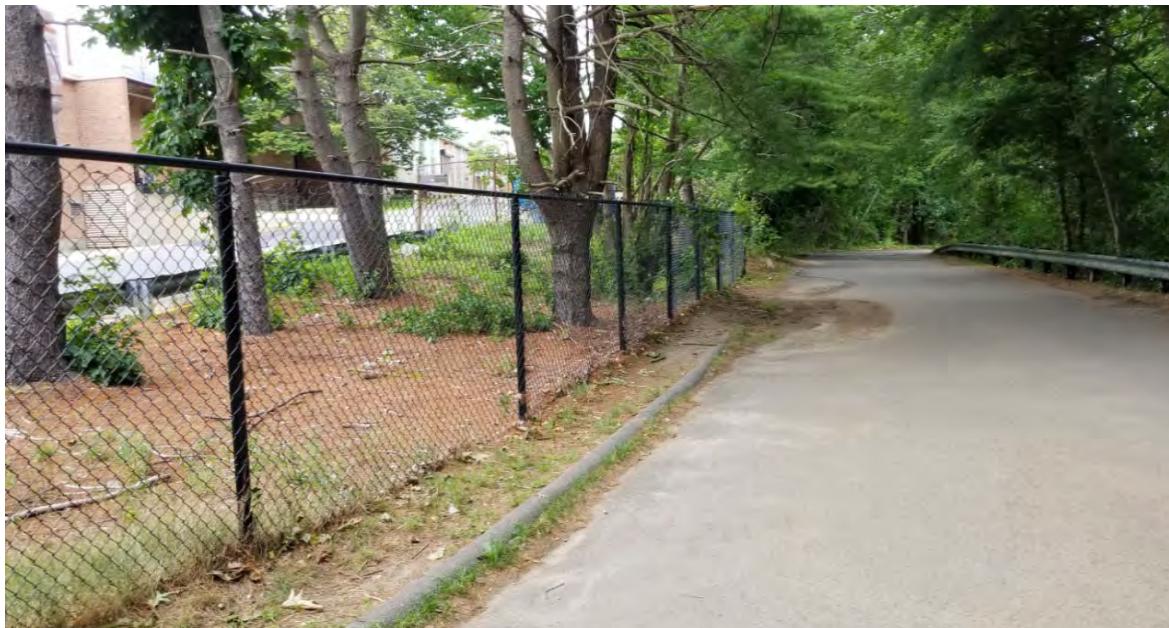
Standing on eastern side of the building, view facing north showing the outer loop trail
